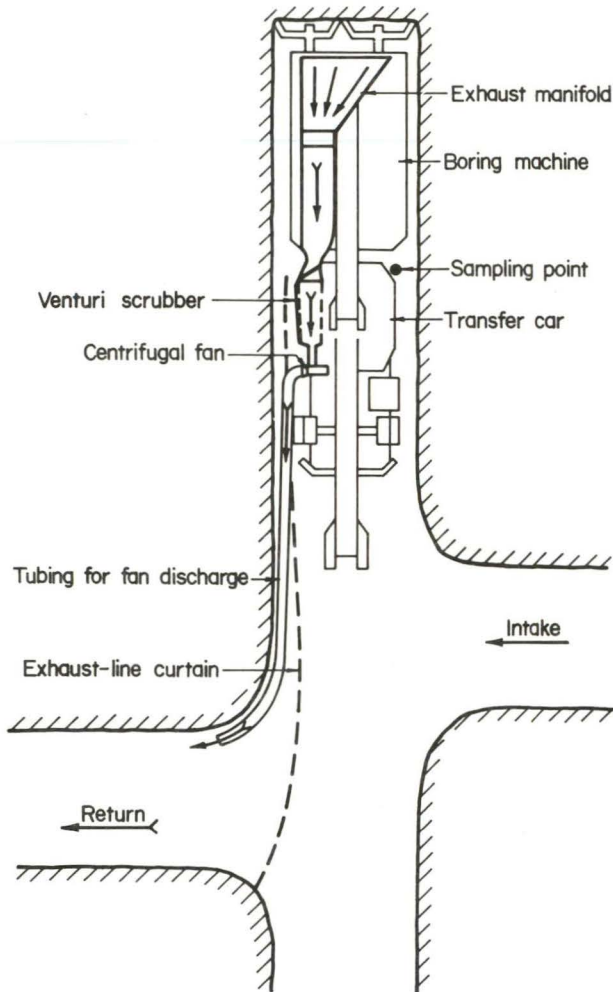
Arrangement for sampling at miner operator position with face ventilated using the exhaust mode.
